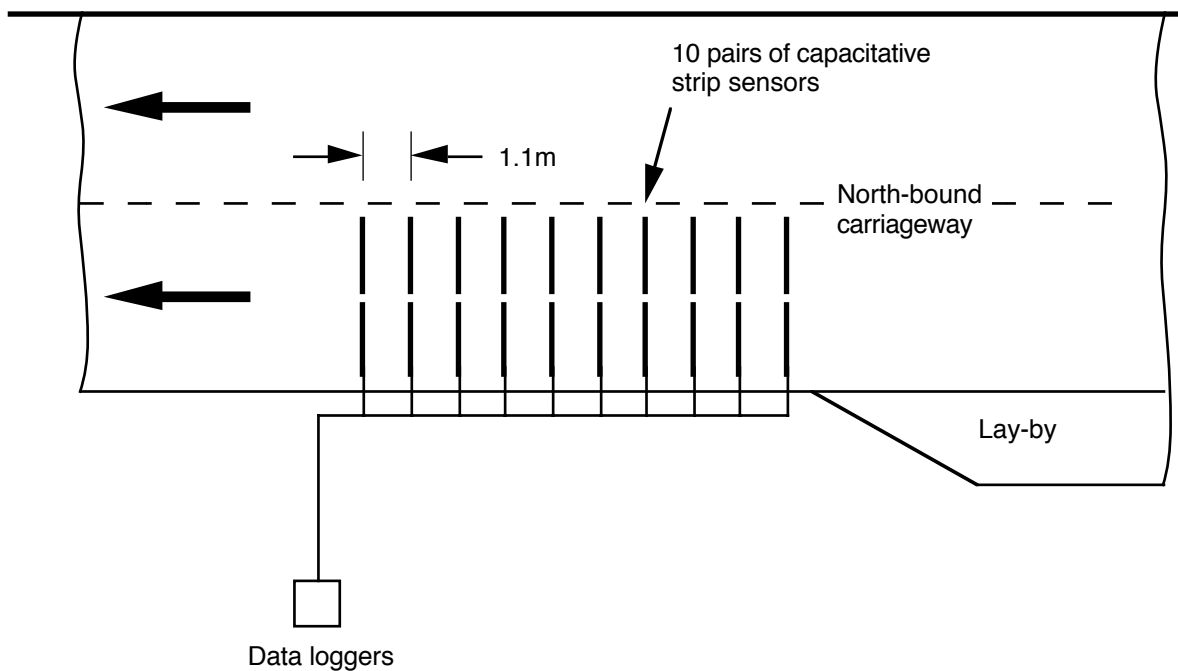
Schematic layout of the WIM site on the A34 trunk road near Abingdon, Oxfordshire.
